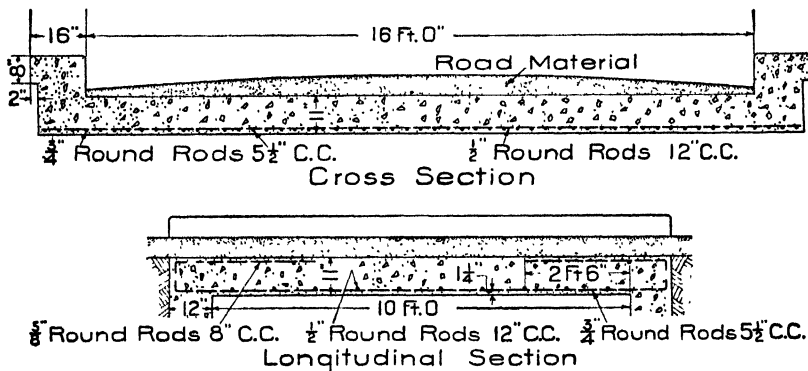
Design for a Slab Bridge. (See p. 696).
